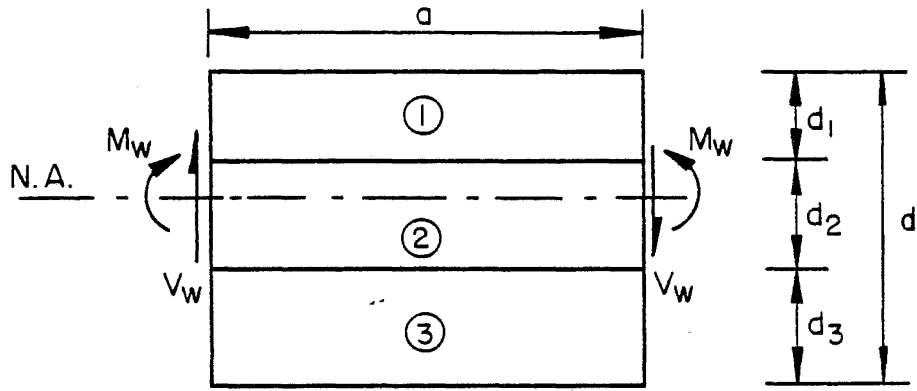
Forces in Segment of Hull Girder Test Specimen
